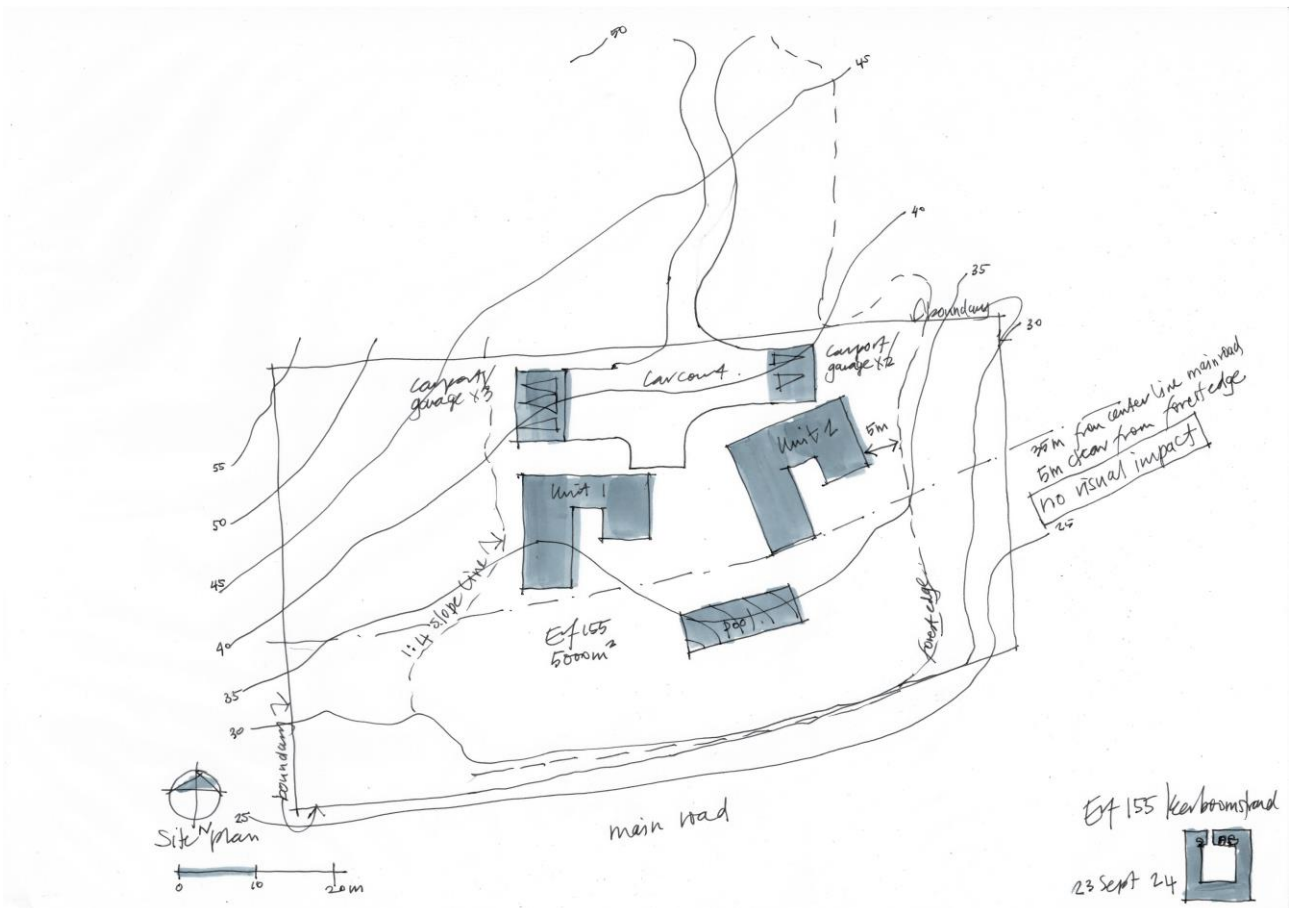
Revised Preferred Revised Site Development Plan (September 2024).
